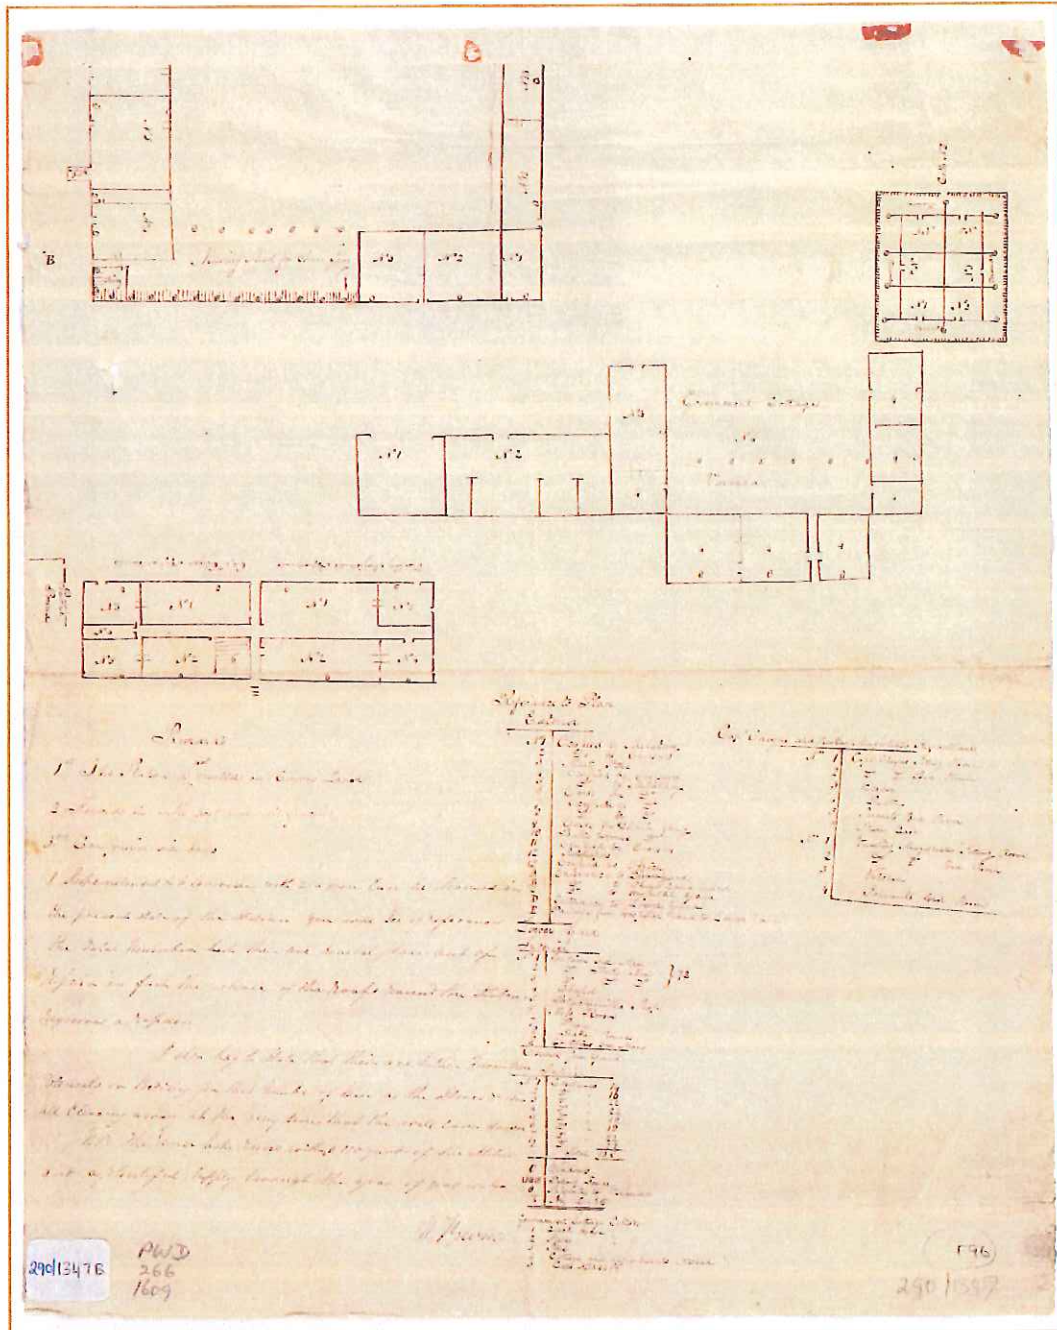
Plan of Perth Bridge Convict Station. Source: LINC Library.
